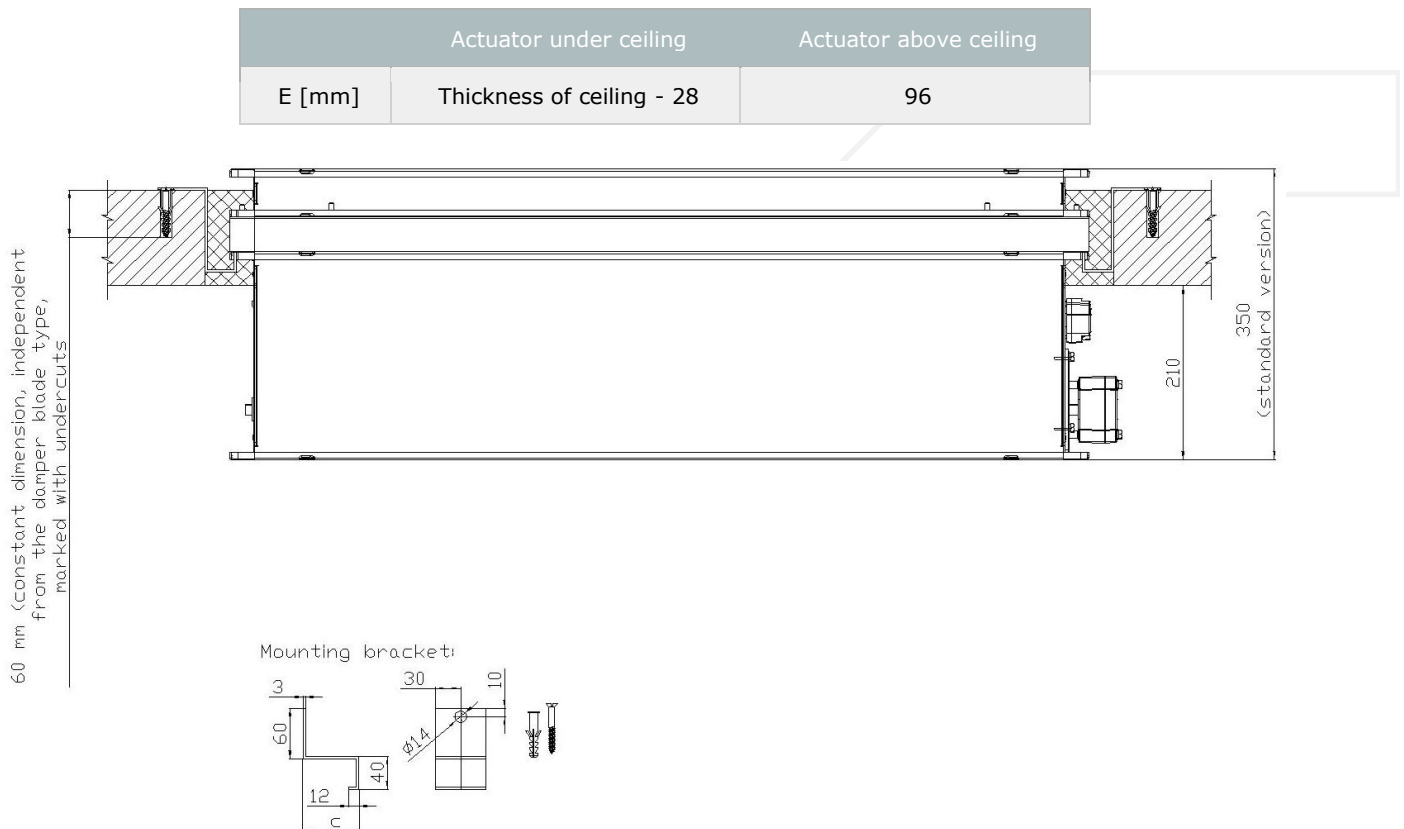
Proposed dimensions of mounting brackets for installation in a ceiling
